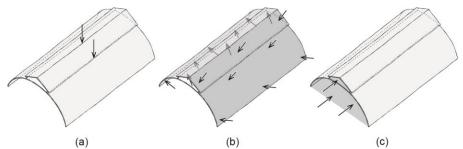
Loads considered in the calculation model: (a) concentrated maintenance load; (b) asymmetric wind load; (c) horizontal wind load
